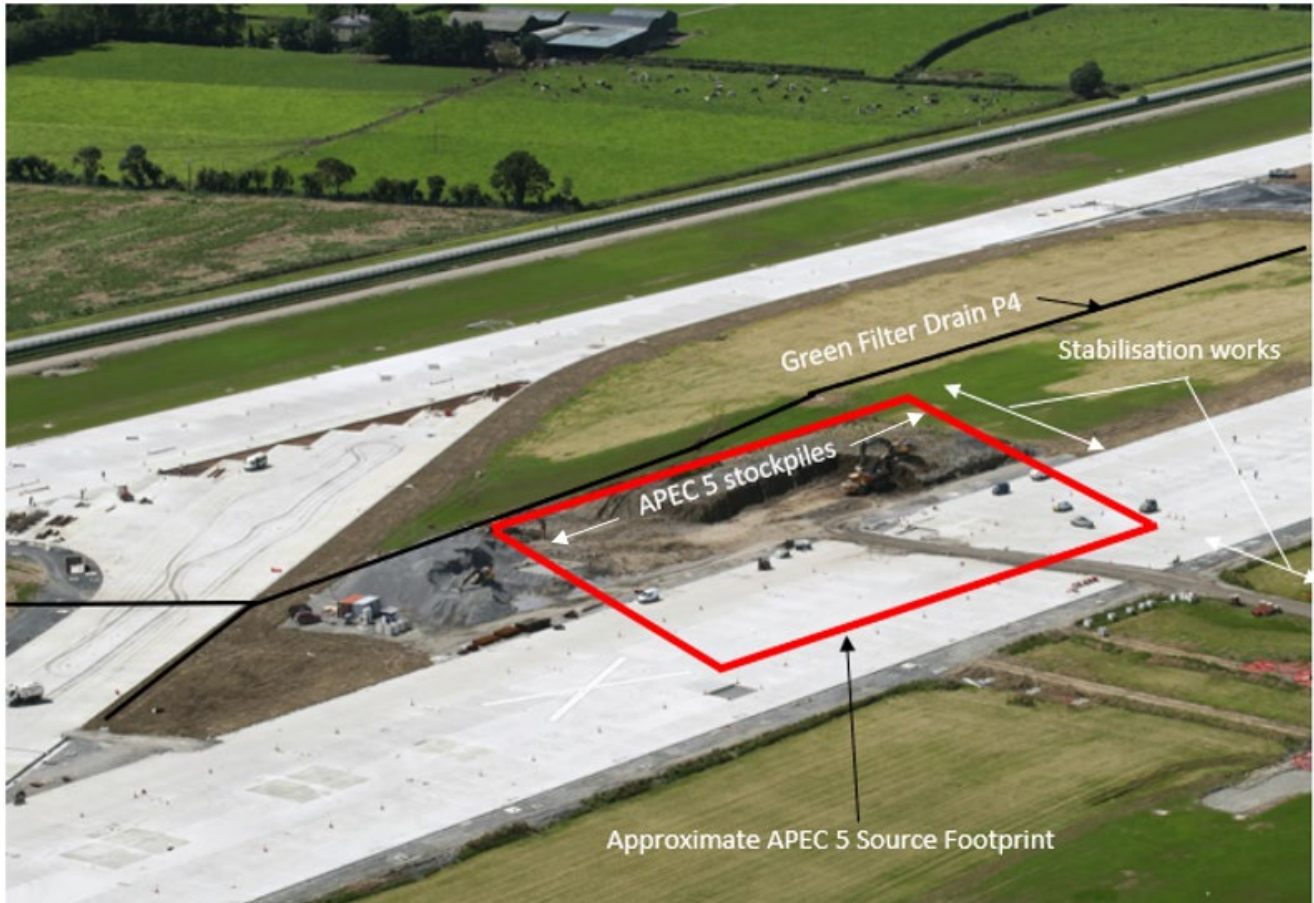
Aerial View of Stockpiled APEC 5 Material Being Excavated for Re-Use as Backfill Around Stormwater Tanks PWHT and R2 (20th July 2020)
